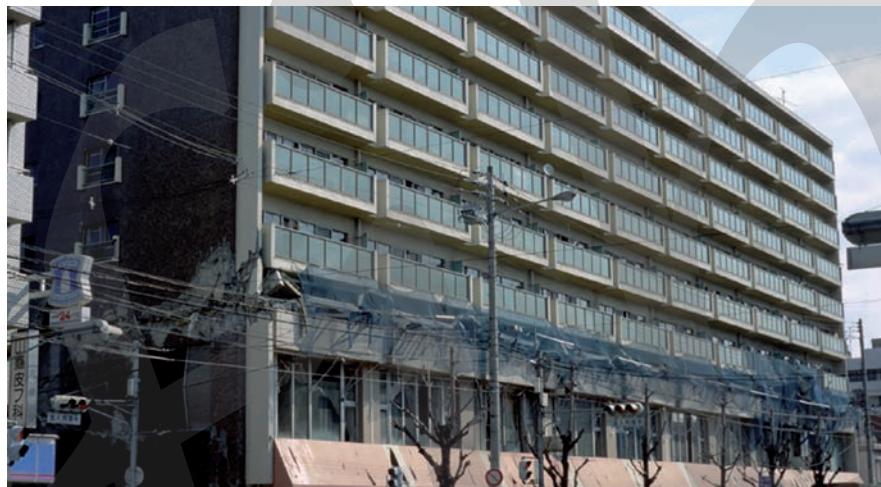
Soft-storey or 'pancake' collapse of the third floor of a building during Kobe earthquake, Japan, 1995 (Photo courtesy of NISEE-PEER, University of California, Berkeley)
